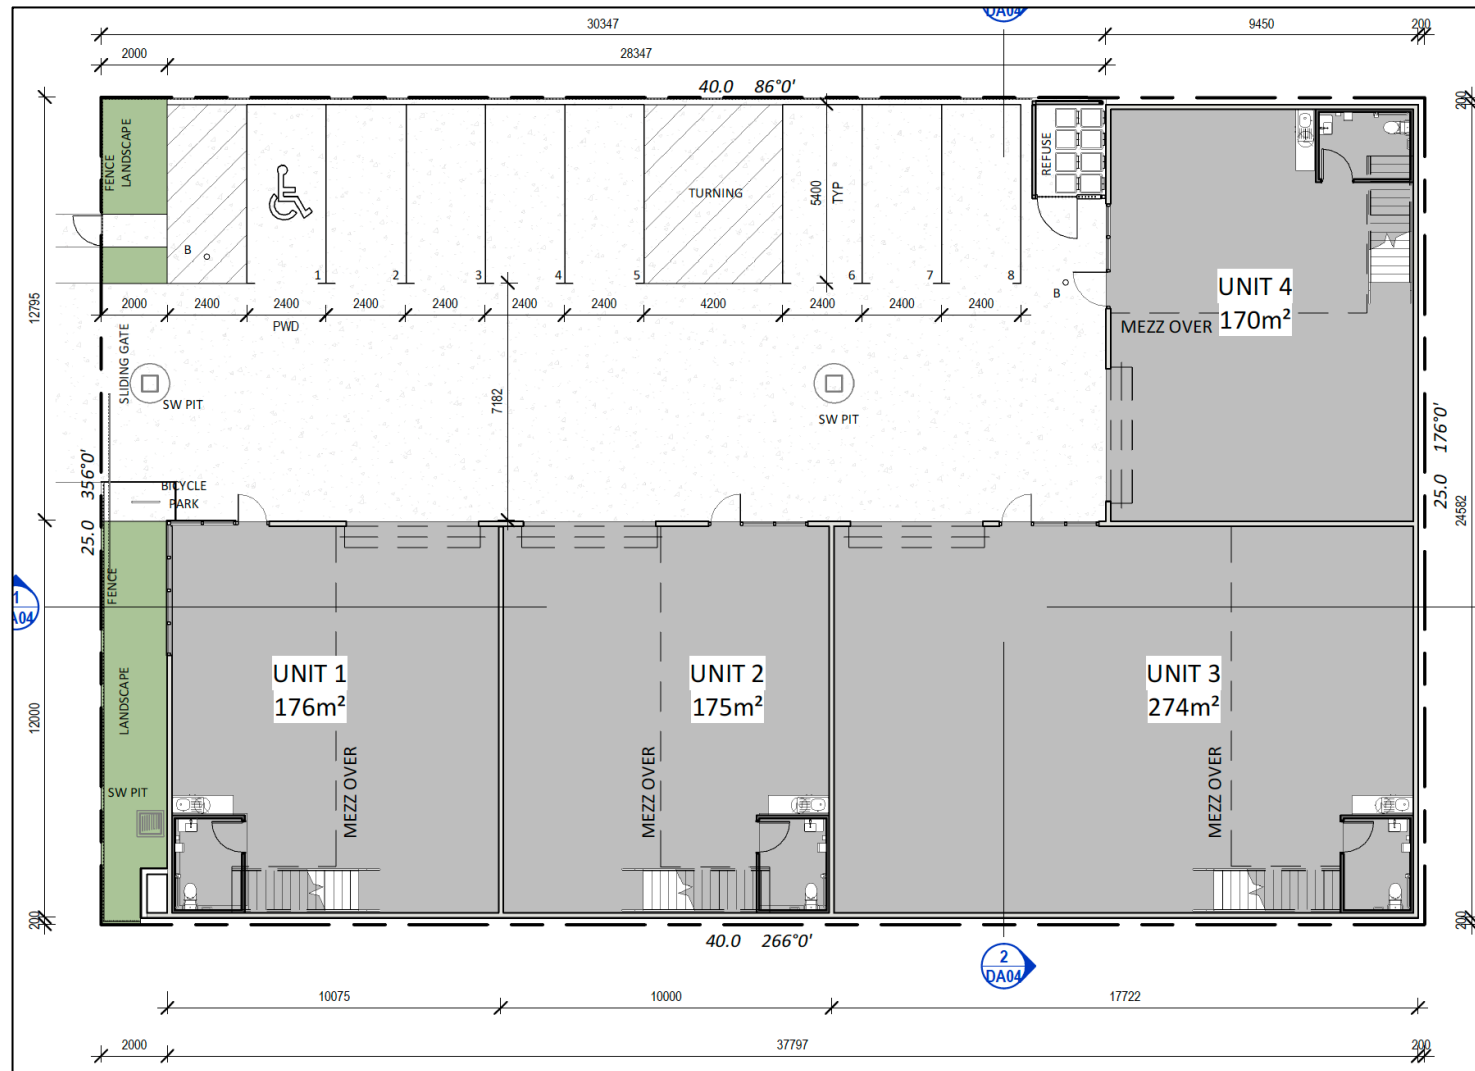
PROPOSED GROUND FLOOR PLAN
